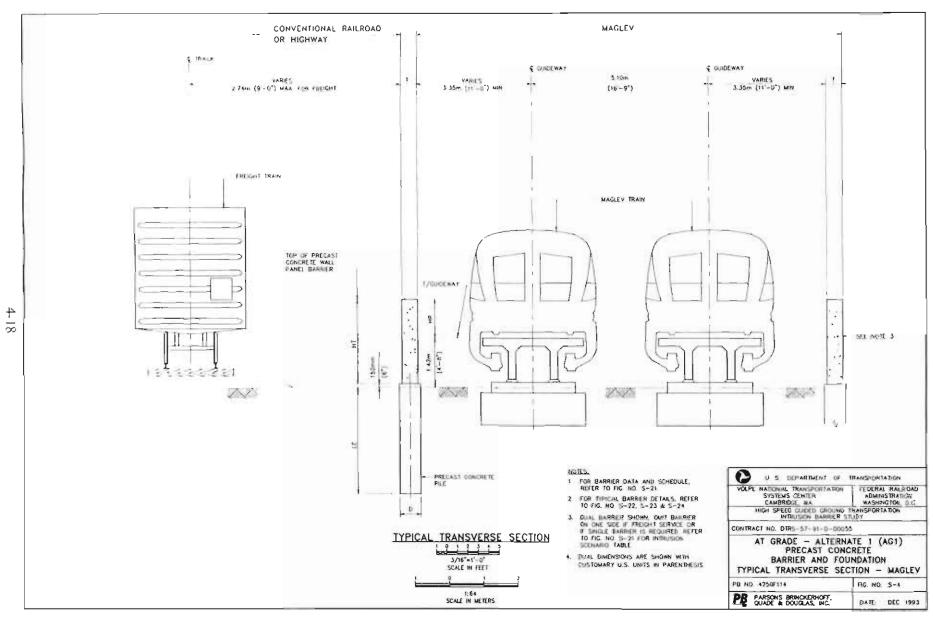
AT GRADE ALTERNATE 1: P/C WALL AND P/C FOUNDATION - TRANSVERSE SECTION/MAGLEV
